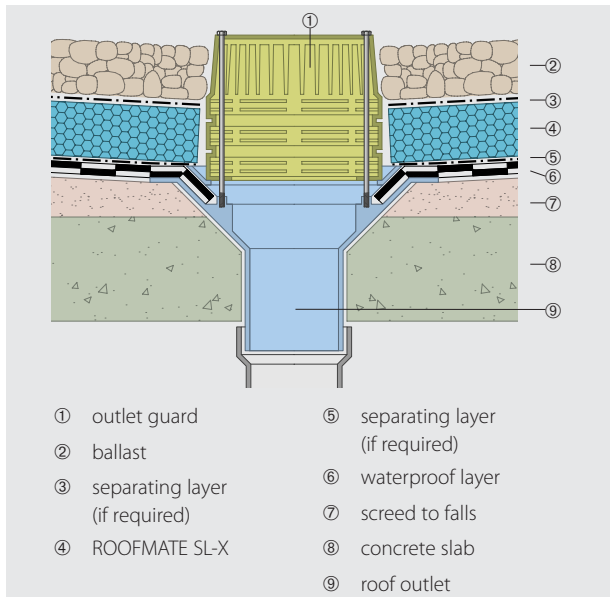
>> Ballasted inverted roof - drain with outlet guard
